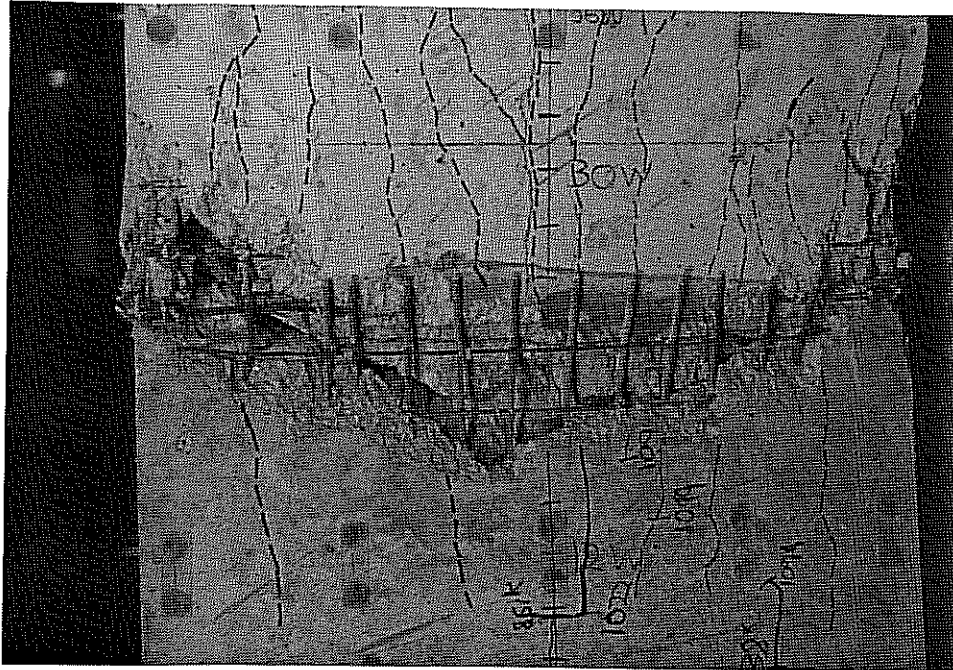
Specimen 5S9 Compression Flange Close-Up
